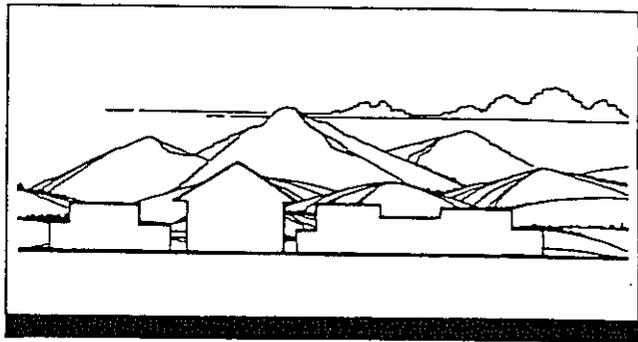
Roof Types and Roof Lines, and Mountains Backdrop
